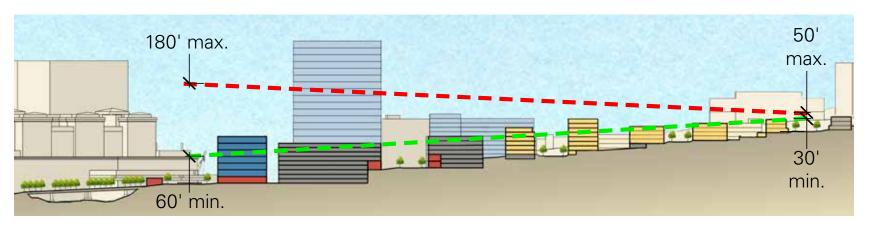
Conceptual Site Section: Red line indicates maximum building height within the site and green line indicates minimum building height. Each line is taken from center of Crawford Street to center of Washington Place. n to the left
